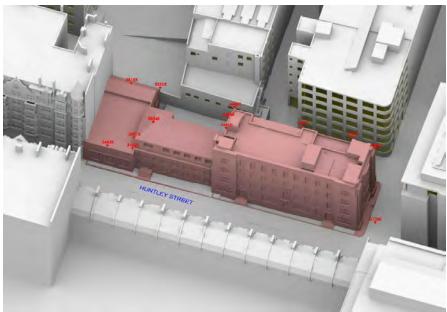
UCLH Site Buildings (in pink) and the surrounding context
